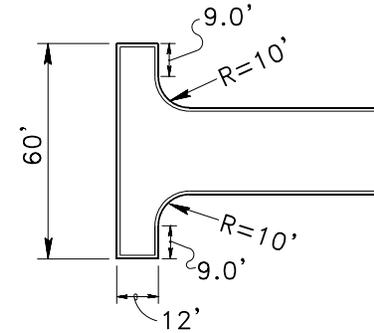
COUNTY OF PRINCE WILLIAM VIRGINIA	Added reference OFFSET (RIGHT) CUL-DE-SAC ON DITCH SECTION STREET	Date
